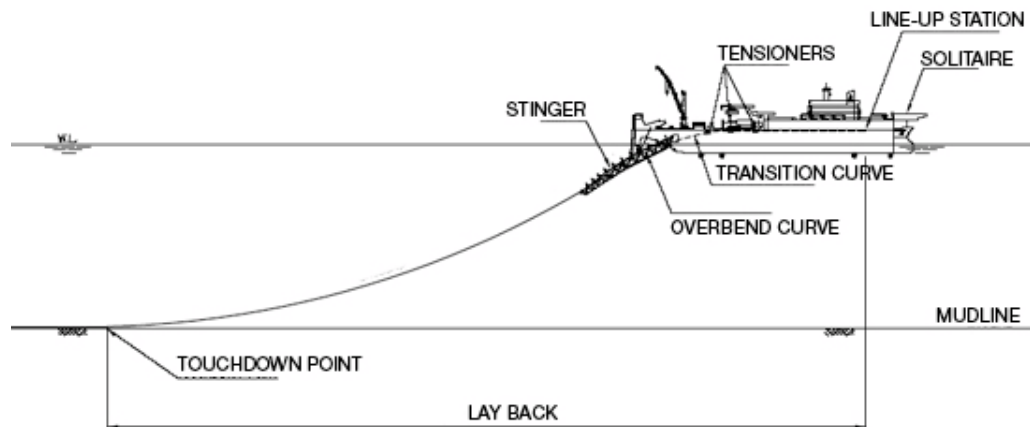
Standard Shallow Water Pipe Lay Barge
